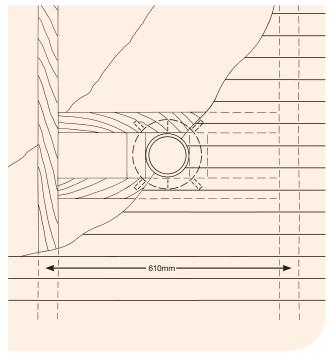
Plan view of Osma Fire Stop Seal under a timber floor
